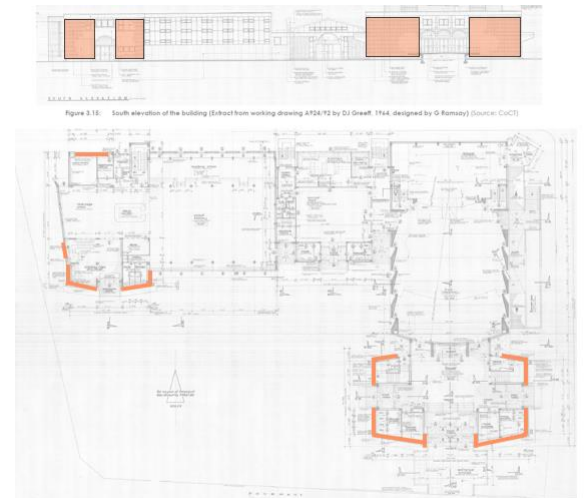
Extract from ground floor plan of the building (Working drawing A724-87 by DJ Greeff, 1967, designed by G Ramsay) (Source: CACT)
